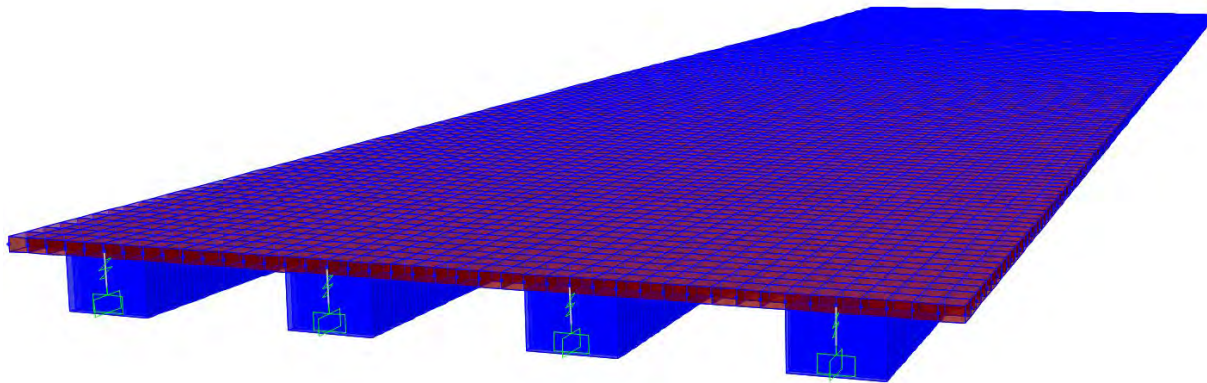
Extruded view of bridge C-15-Y under the loading for $h^*=0.3$
